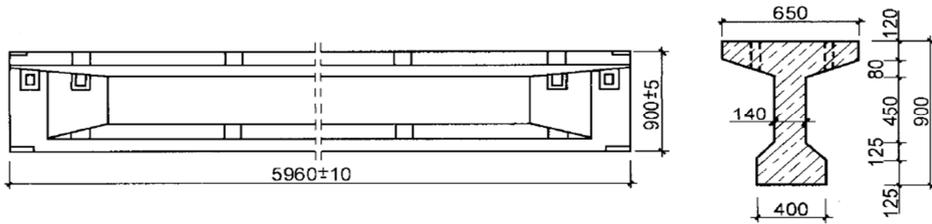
Example of pre-tensioned prestressed crane beam of type BSFF-90/6 (dimension in mm) (Ajdukiewicz, Mames 2008)
